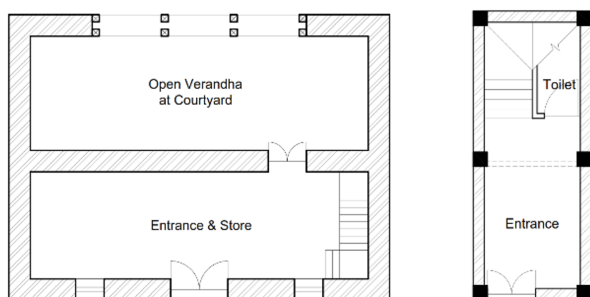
Typical Traditional (Left) & Modern (Right) Ground Floor Plan
